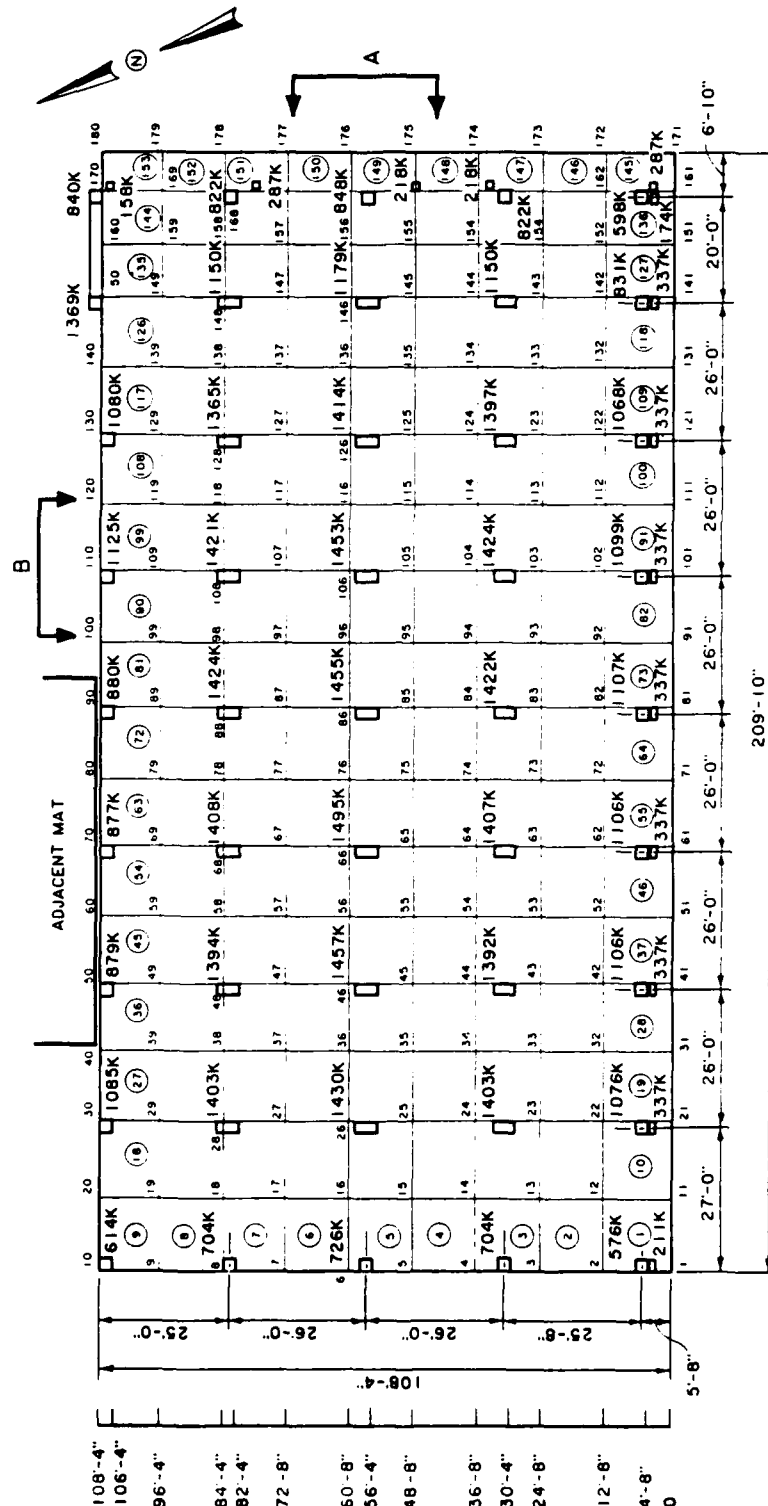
Foundation plan Wilford Hall Hospital, Lackland Air Force Base, with column loads in kips
